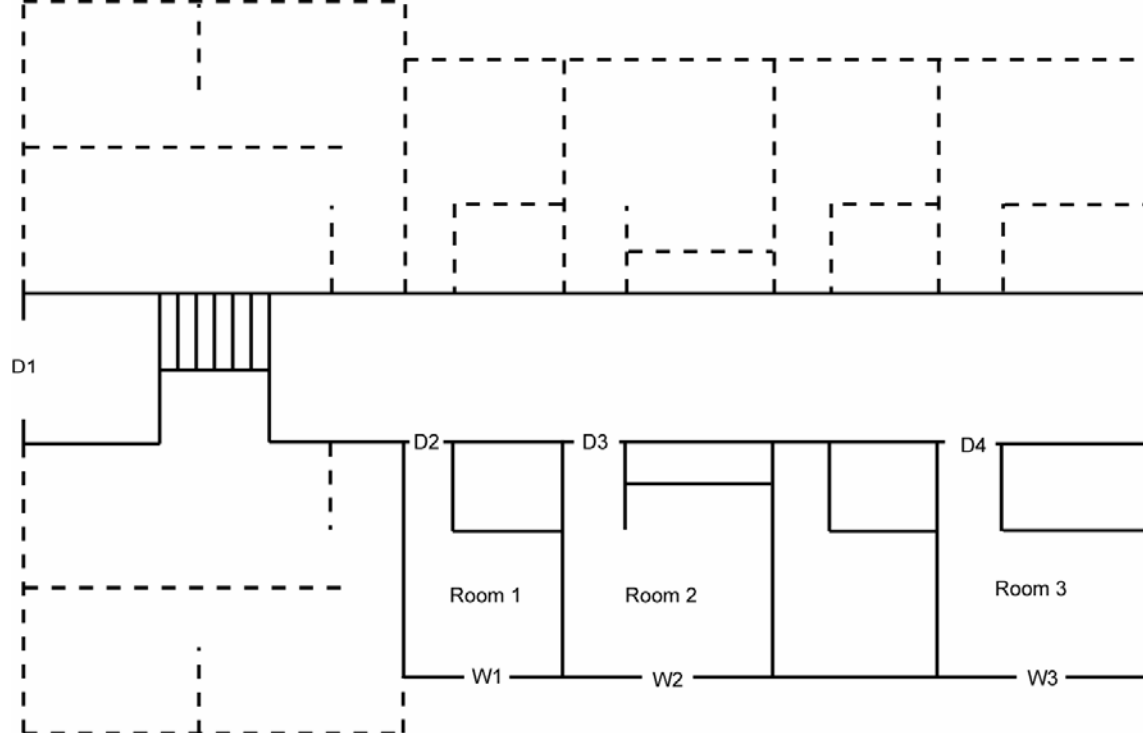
; Layout of the 1st floor of the structure (the “Travis-building”, Austin, TX)
